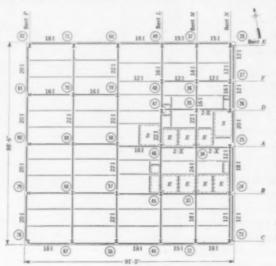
Framing Plan for Tower Floors 41st to 56th Floors
